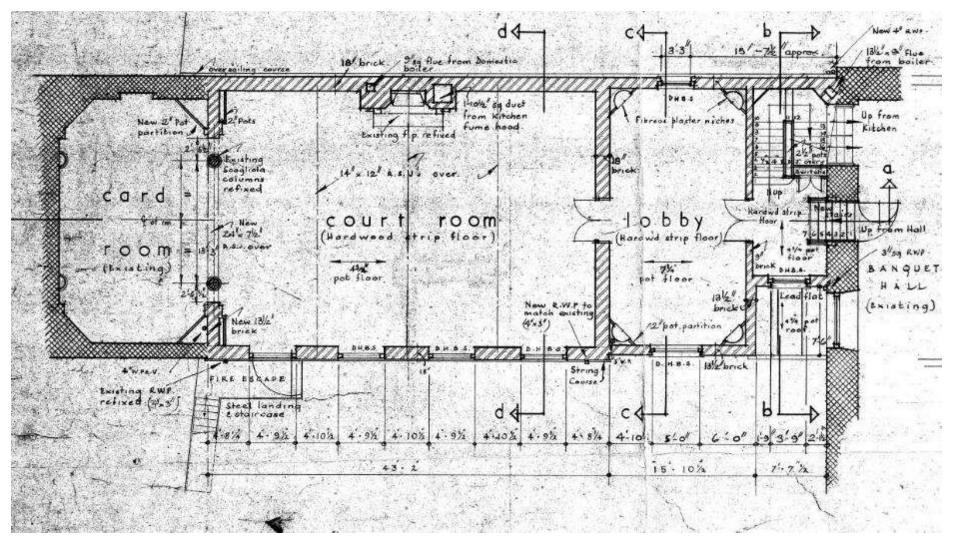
Proposed Drawing for reconstruction of the Court Room and Linking Building, Dawson & Son, 1954. Note the Link Building no longer imitates Mylne's swept-back elevation; the Anteroom is rectangular in form with corner niches (extant).
